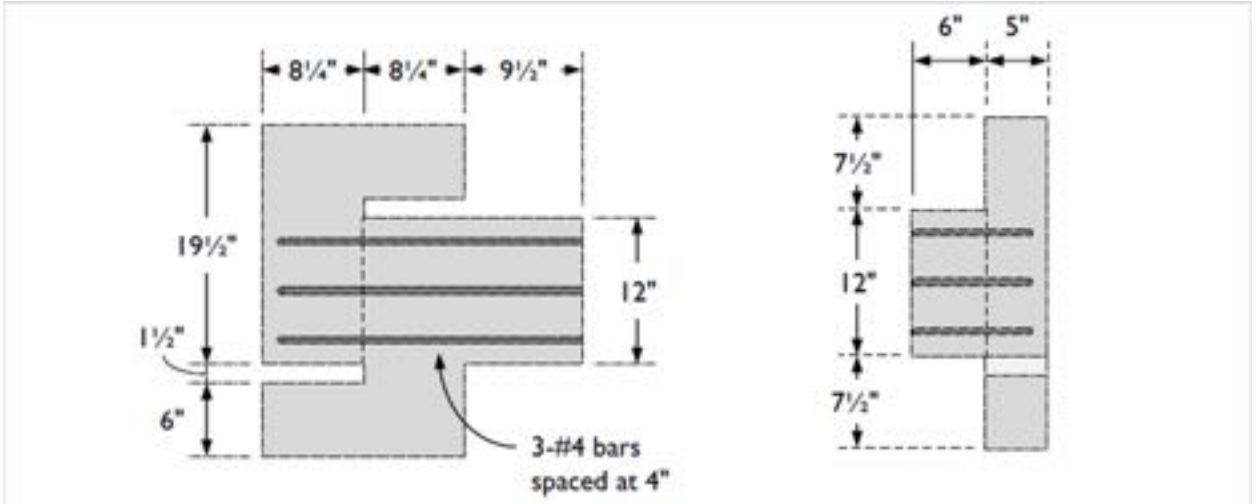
Geometry of final specimens with asymmetric reinforcement crossing the shear plane: (a) front view and (b) side view
